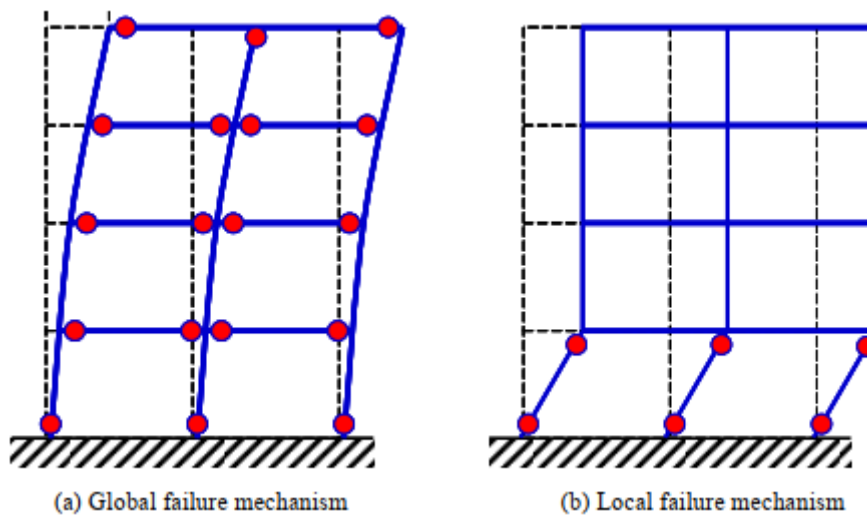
Failure mechanisms of structures with “strong column-weak beam” design[5]
